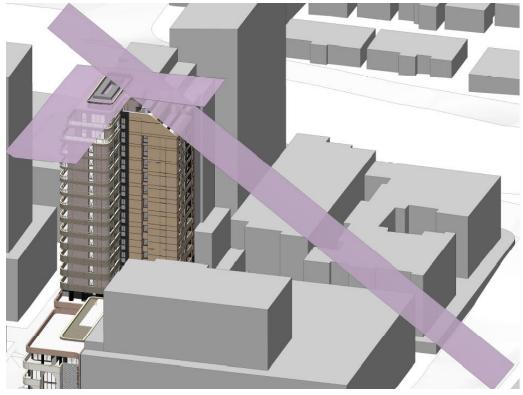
Building Height Plane Diagram (Source: Drawing No. PTW-DA-Q12C010)
